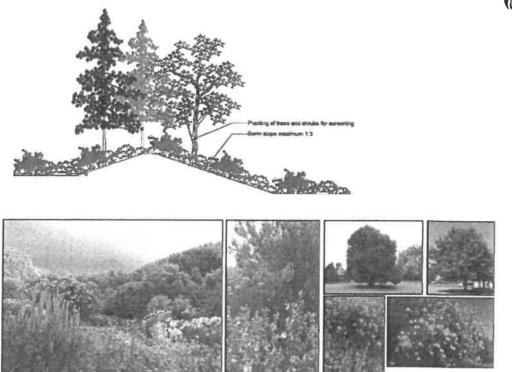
Planted berm concept (above) and Fynbos and Renosterveld planting species
